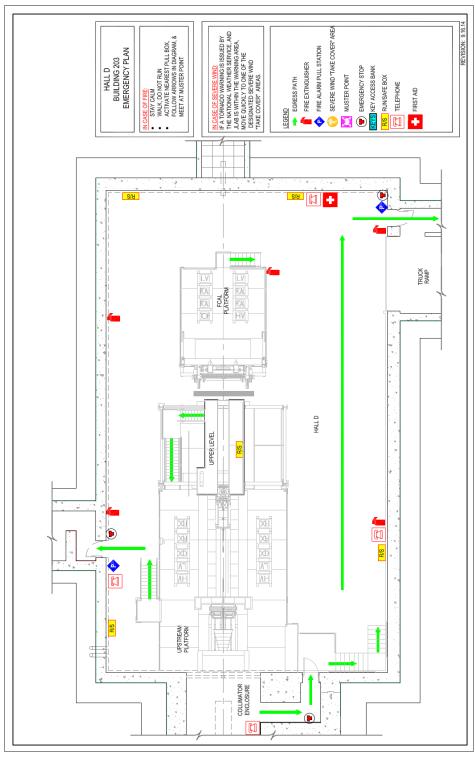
Layout of the Hall D tagger hall indicating safety equipment and emergency plan.
